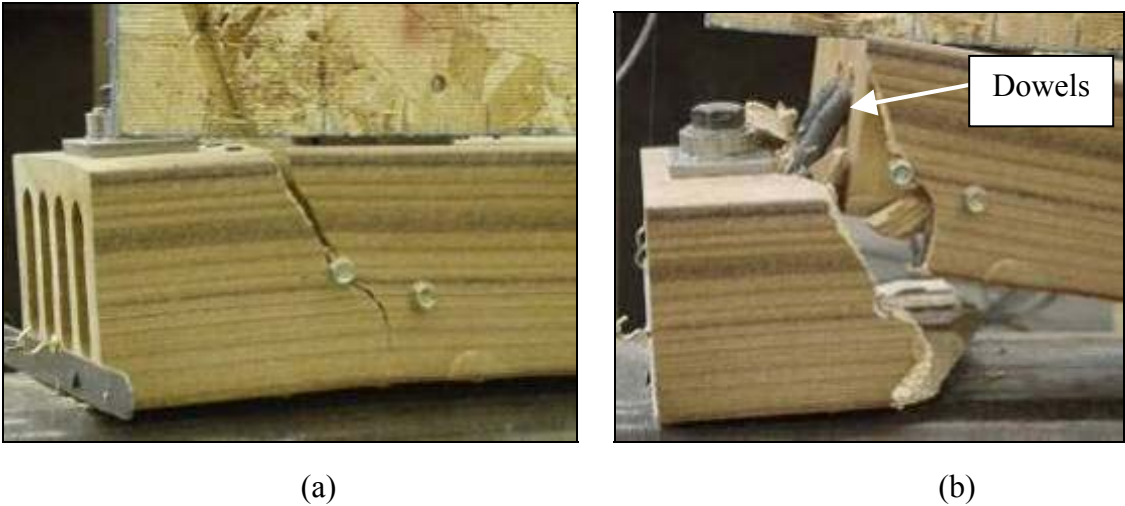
Sill failure at end stud: (a) First flexural failure, (b) Failure through section and dowels crushing upper flange and yielding
